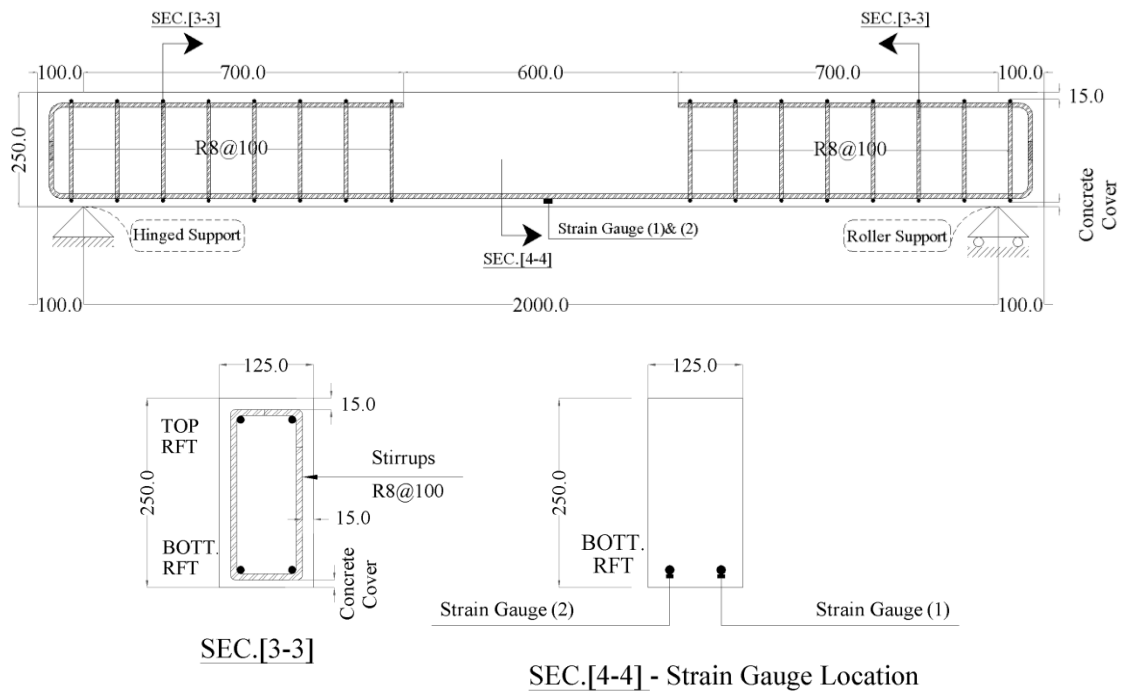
Longitudinal and Cross Section for R.C. Beam without Top RFT (Set II).
